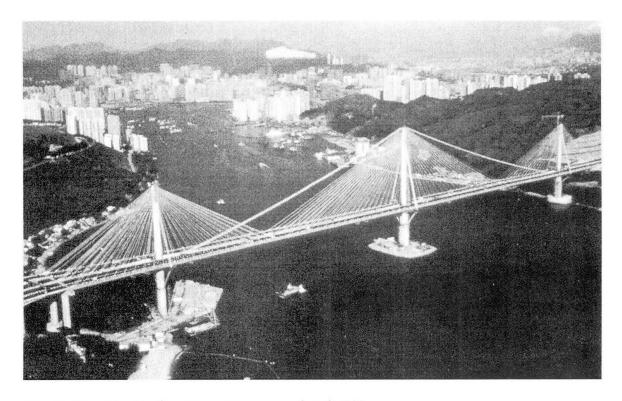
Ting Kau Bridge, Hong Kong, completed 1998
